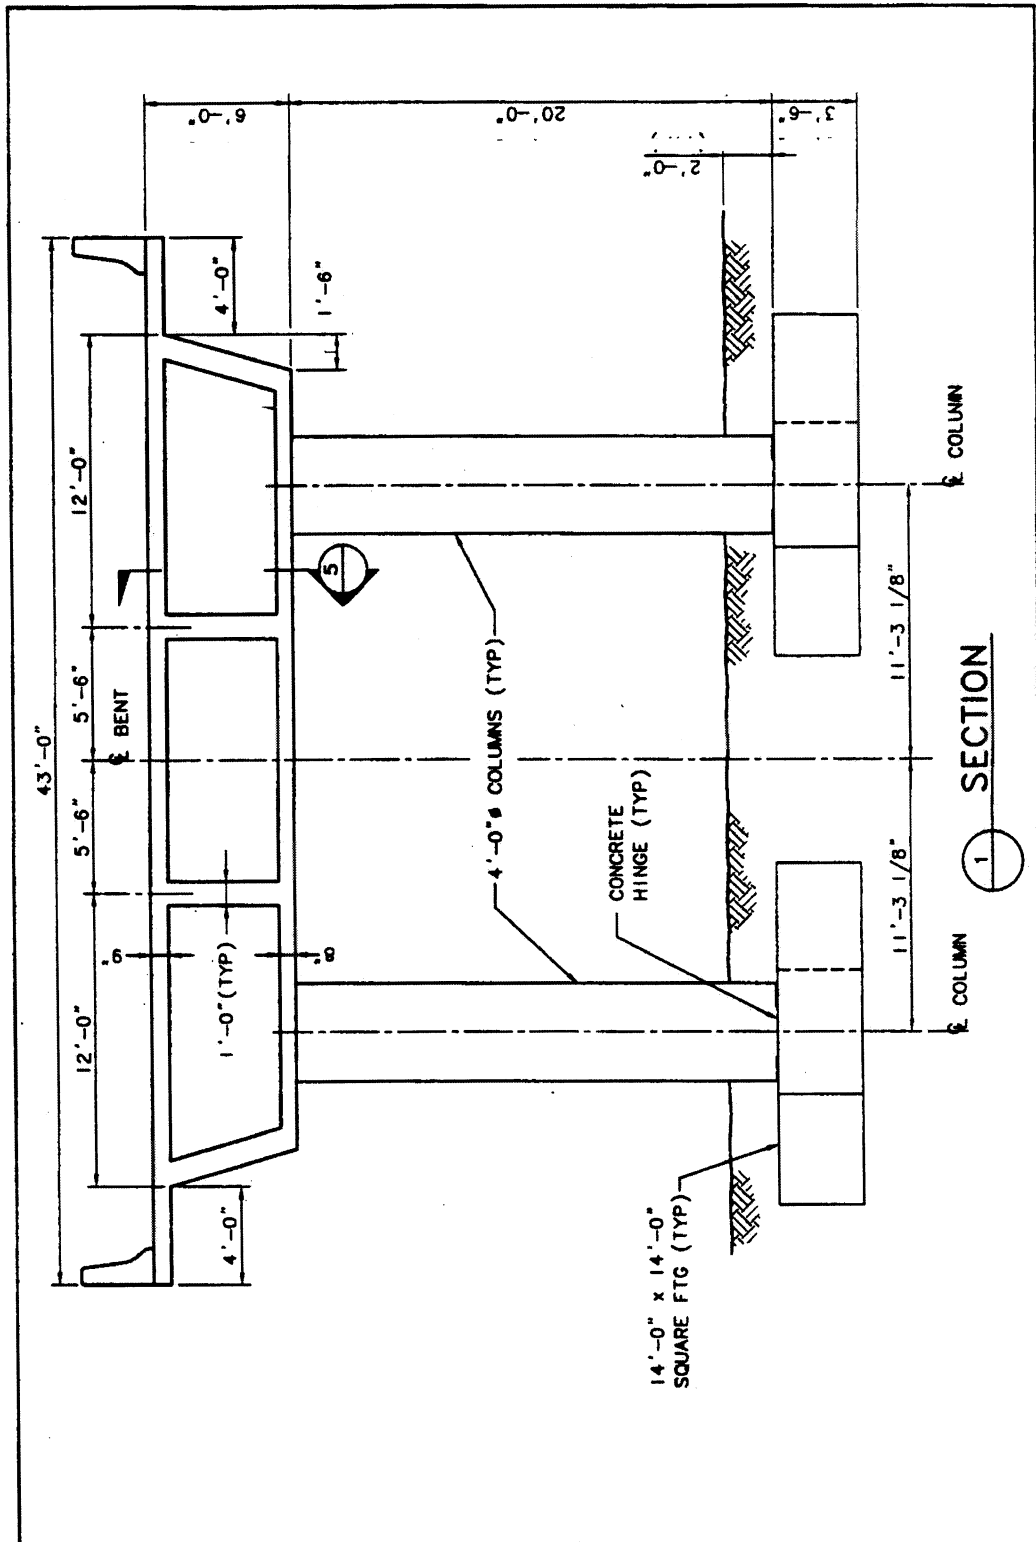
Bridge No. 4 – Typical Cross-section
